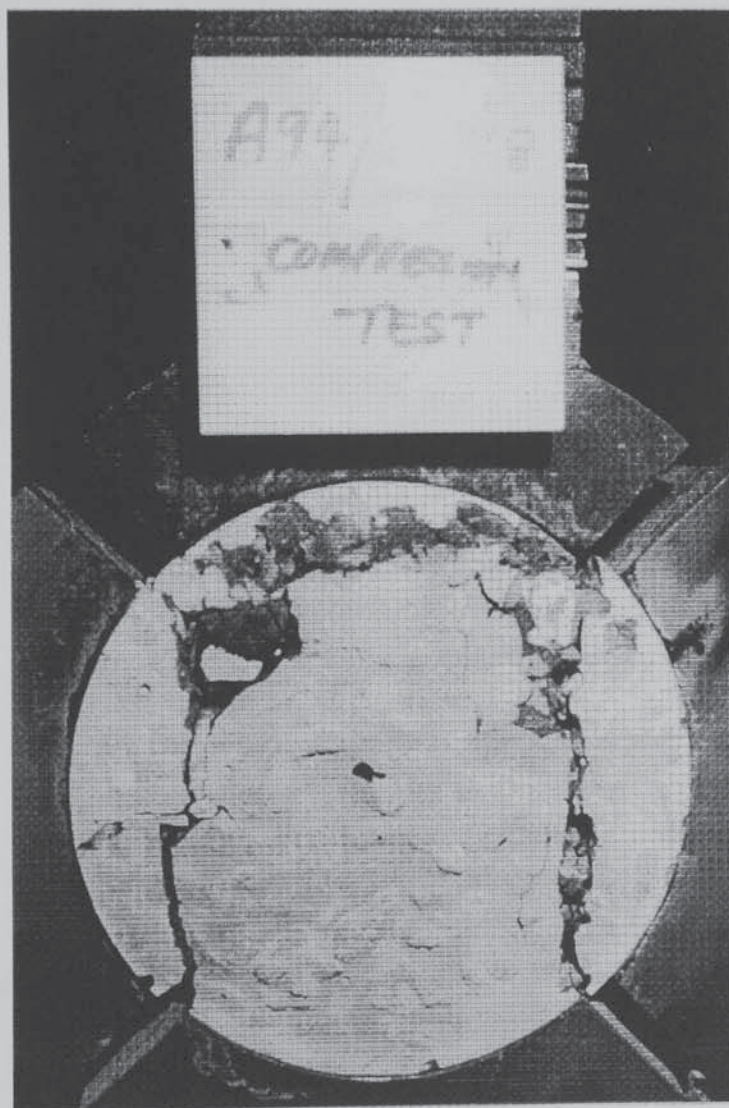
Failure modes of concrete specimens in test rig at ambient temperatures loaded in a single vertical direction
